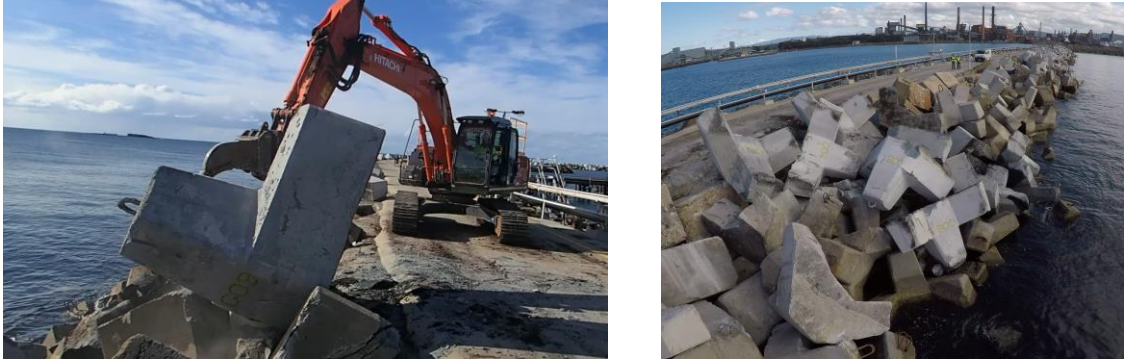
Placement using under-sized excavator (left) and view of the completed installation (right)
